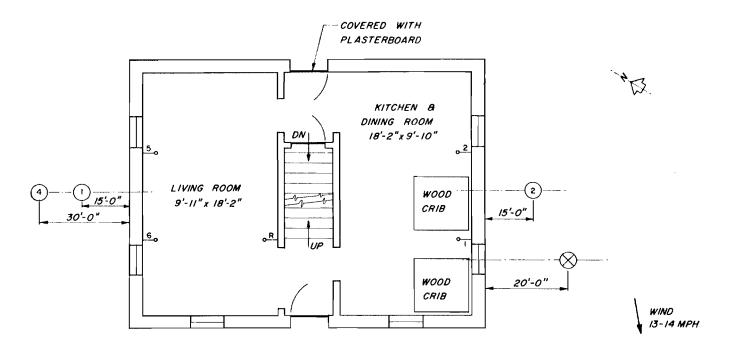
BUILDING No. 2 - TWO-STOREY SOLID BRICK DWELLING
